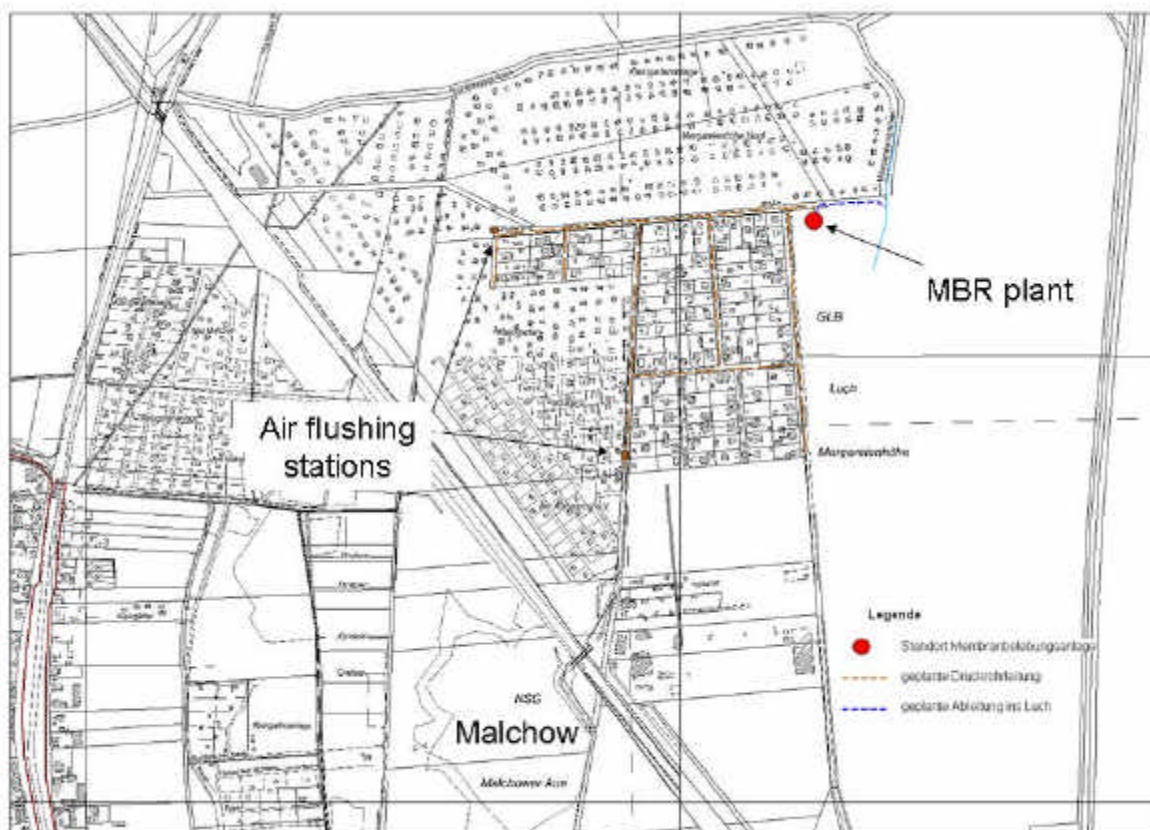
Site plan of pressure sewer in Margaretenhöhe
